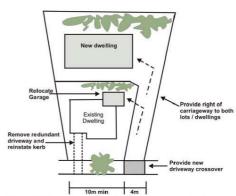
Access requirements for dual occupancy dwellings without direct street frontage
